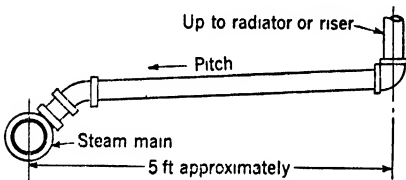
TYPICAL STEAM RUNOUT WHERE RISERS ARE NOT DRIPPED
